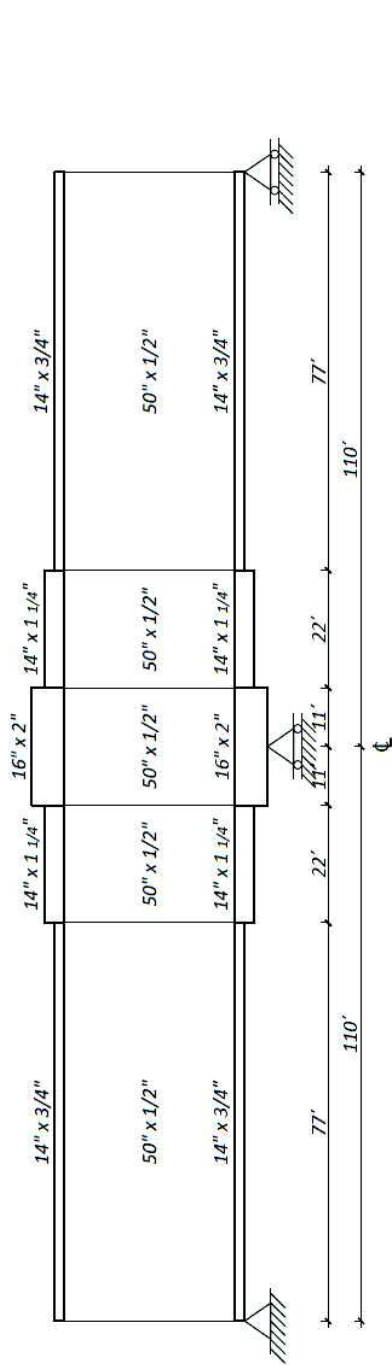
Sketch of the typical 110'-110' two-span composite steel I-girder bridge
